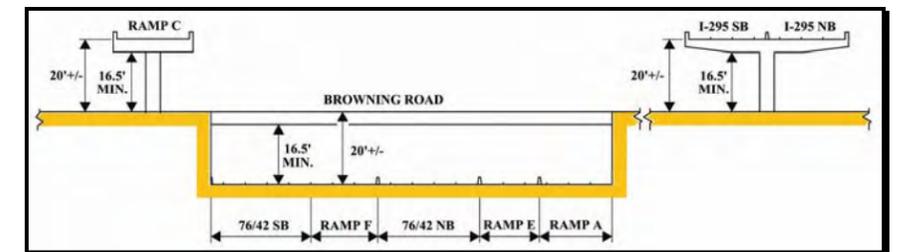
Section A-A at Browning Road (Alternative I)
